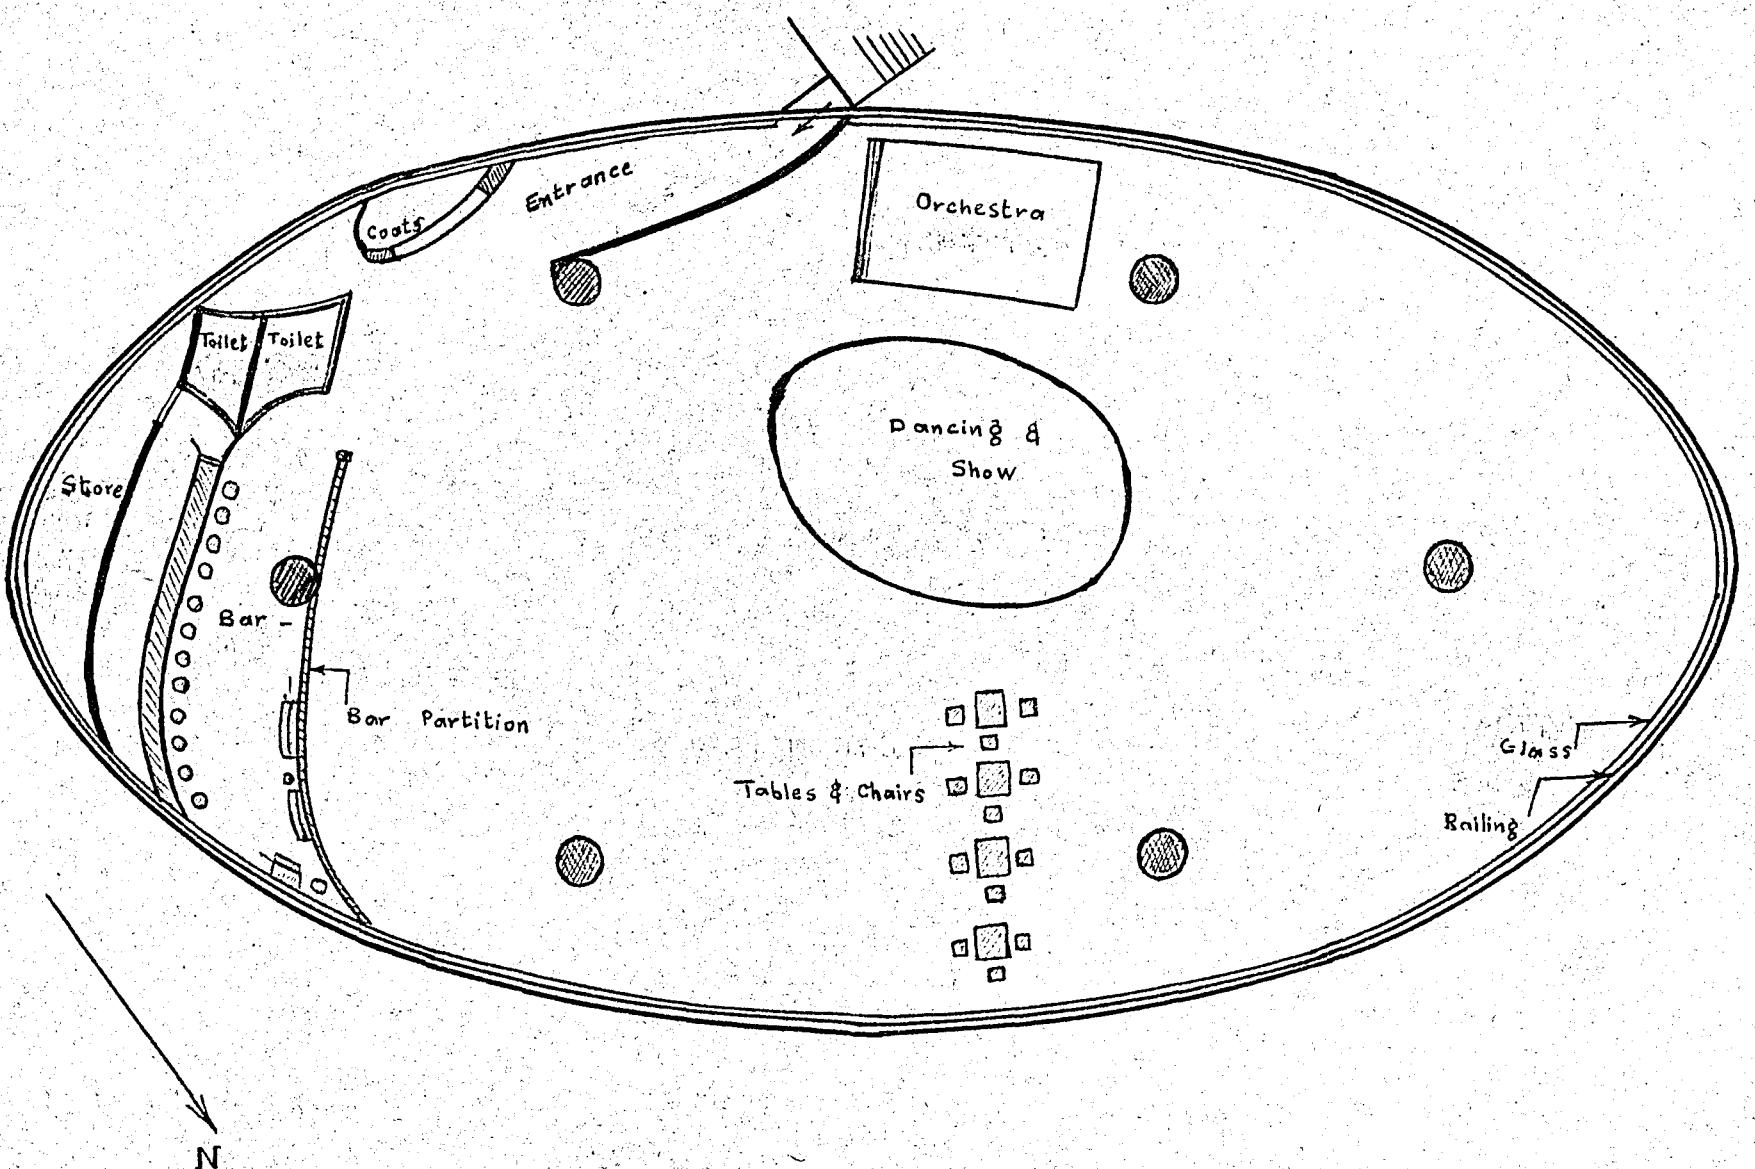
Interior Plan of the Casino's Night Club & Bar (Scale 1/200)
